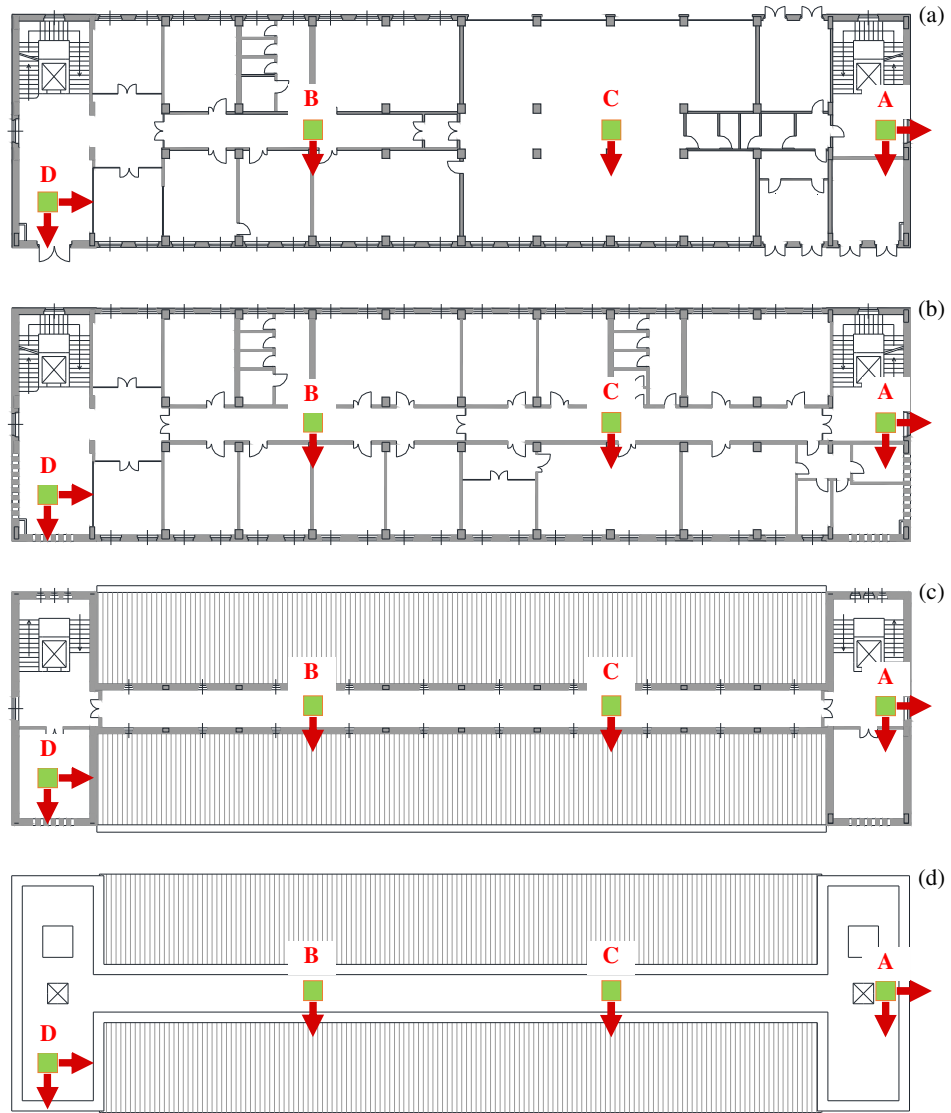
Sensors arrays in Building 1: (a) ground floor, (b) first floor, (c) attic floor, (d) roof.
